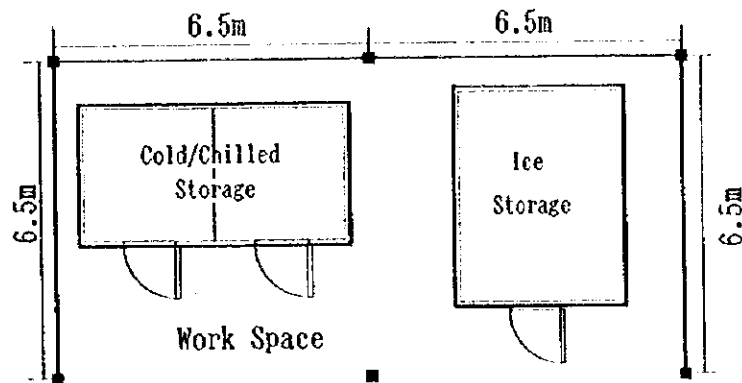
Layout of Ice Making Plant and Cold Storage
